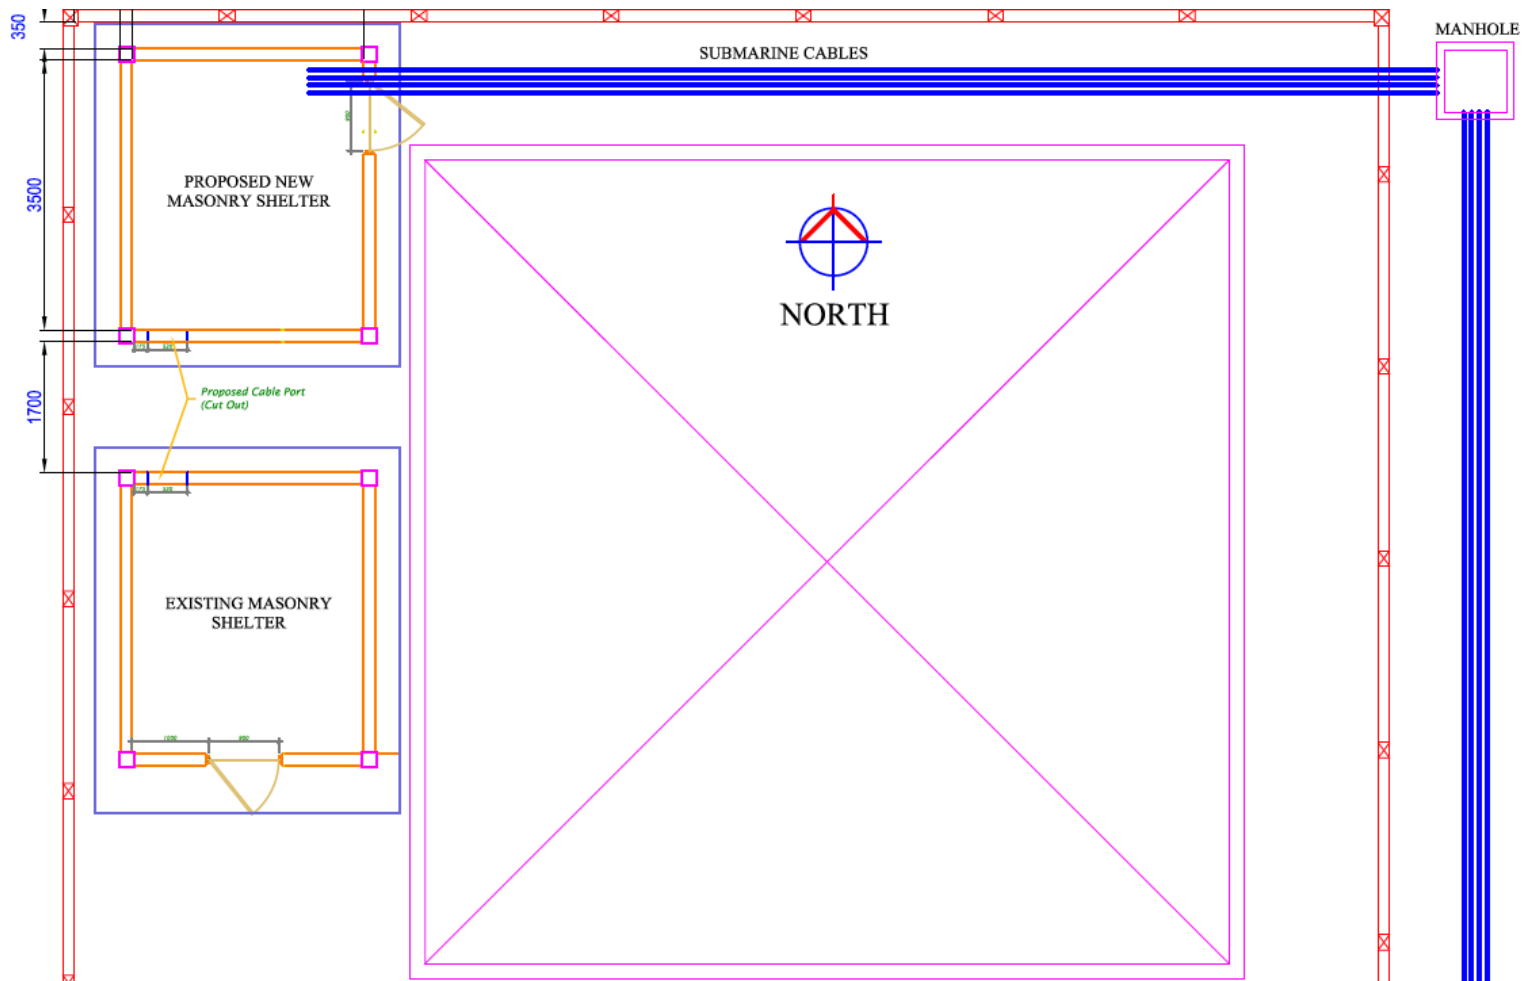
Site plan of masonry shelter in B.Eydhafushi
